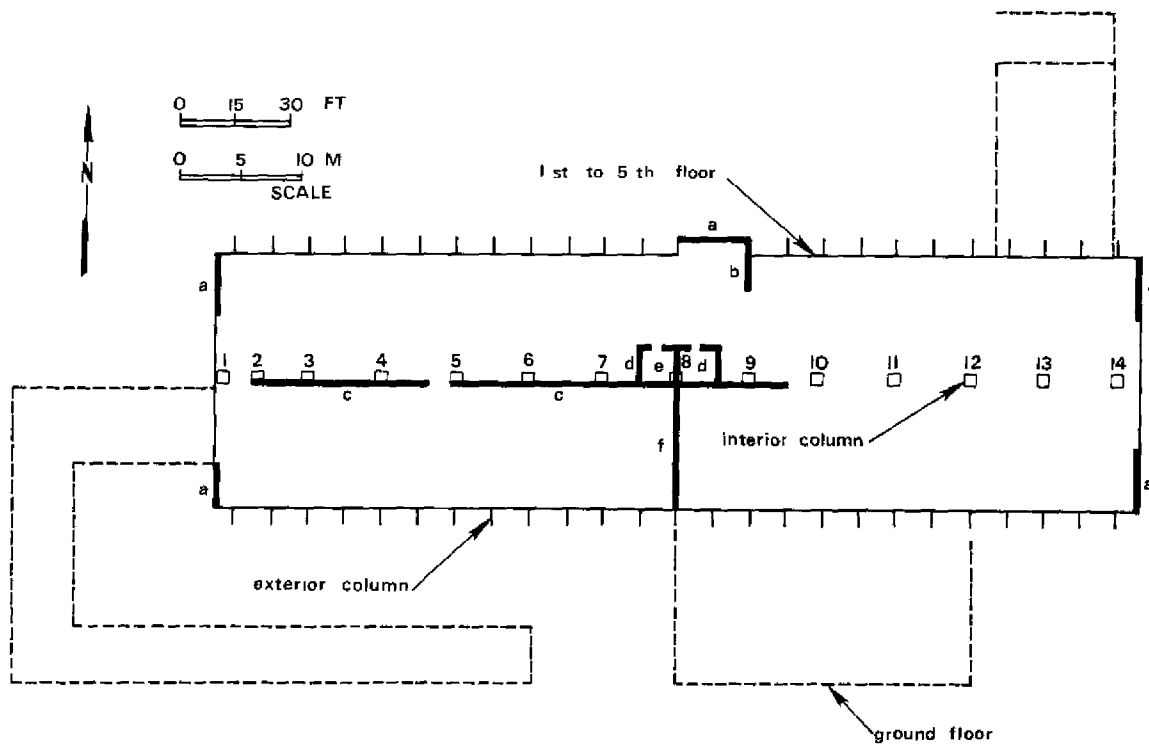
Floor plan of Engineering Building, UCSB.
